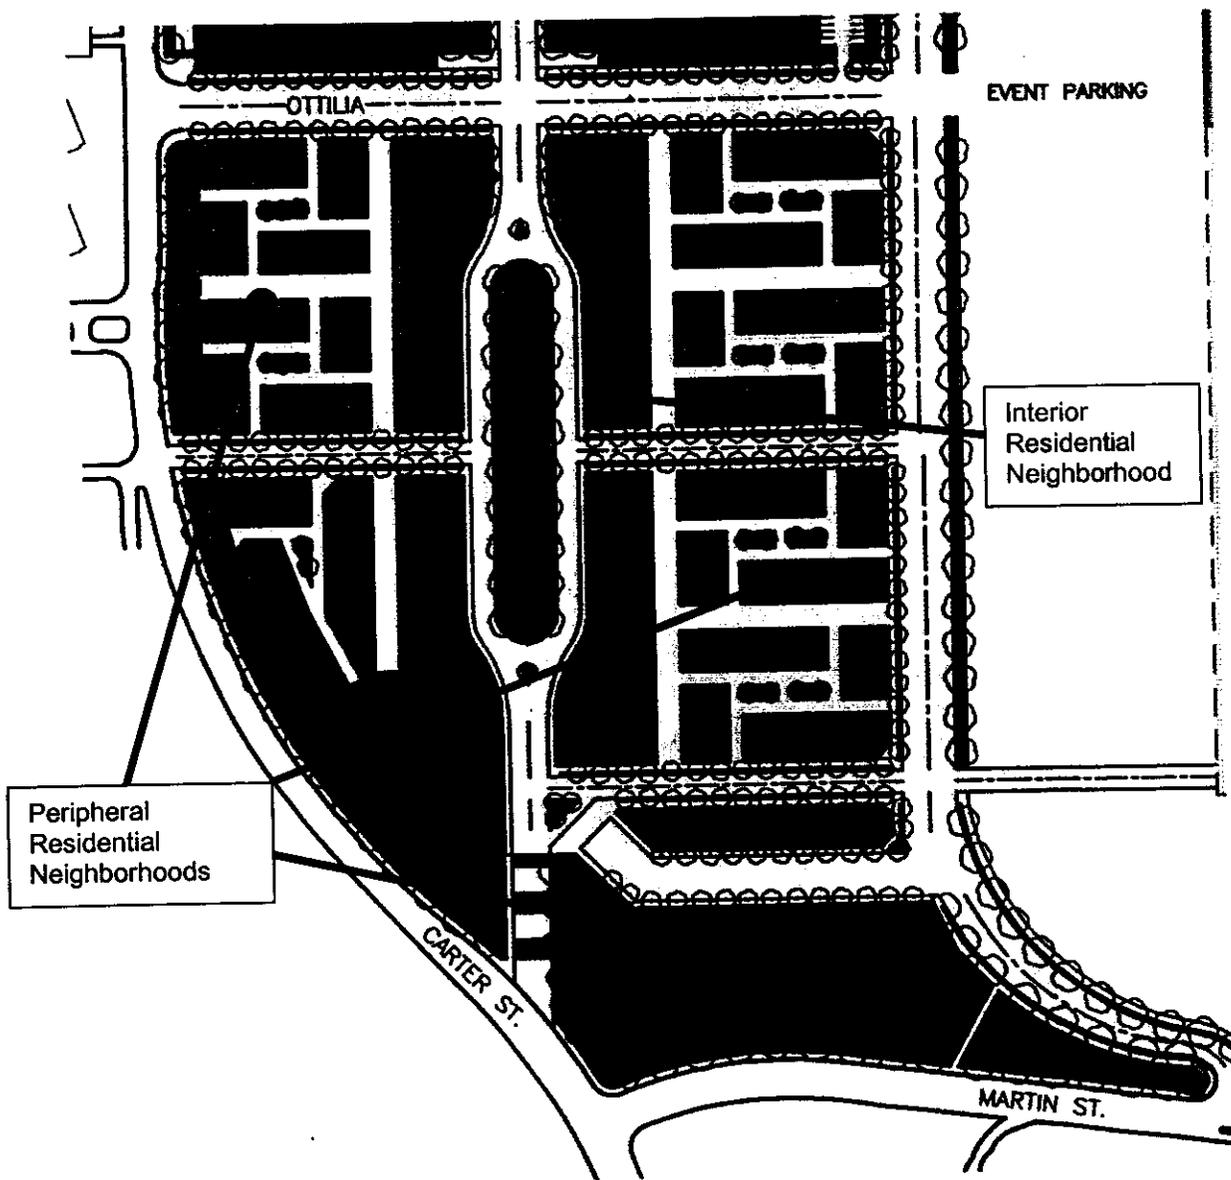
Illustrative Plan. Interior Residential Neighborhoods.
